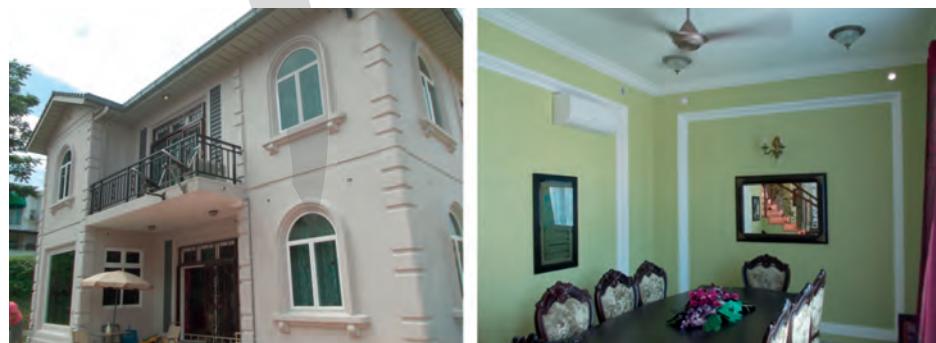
Precast concrete in housing using precast concrete wall panels and corner columns, shown in relief on the right in Malaysia
